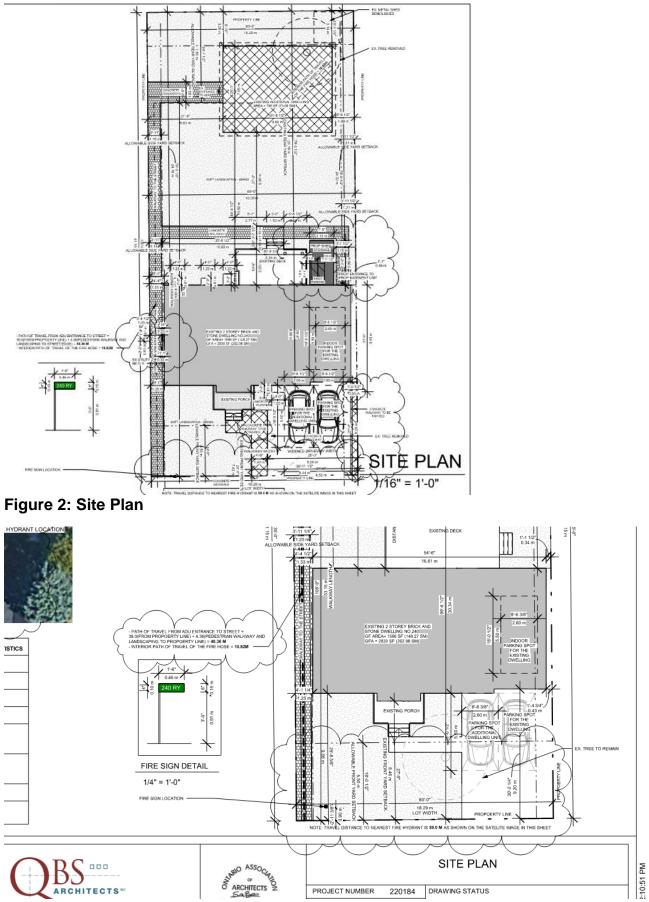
2022 Site Plan and Walkway for Additional Dwelling Unit (Detached)
